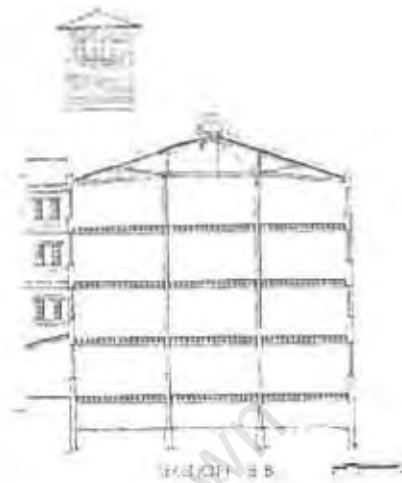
/20: A section through Building 2 showing the structure (Source: Piet de Beer)
